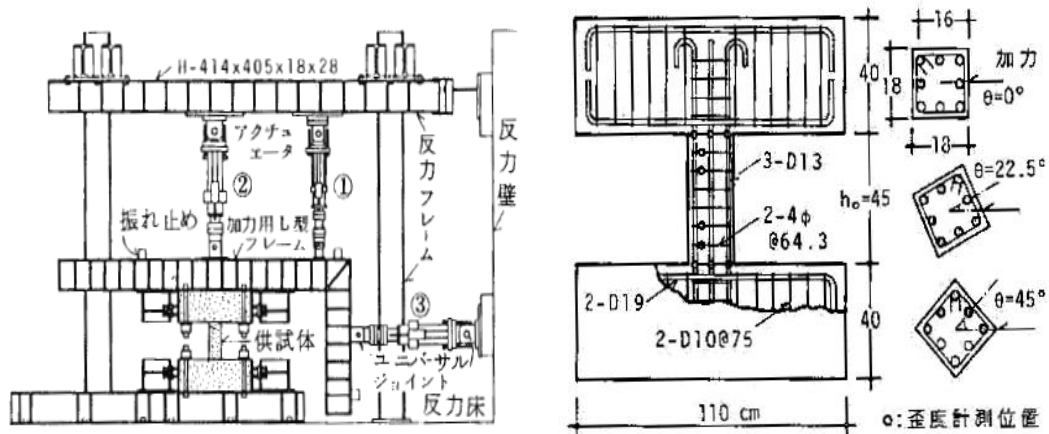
Loading conditions and the cross section dimension of the specimen
